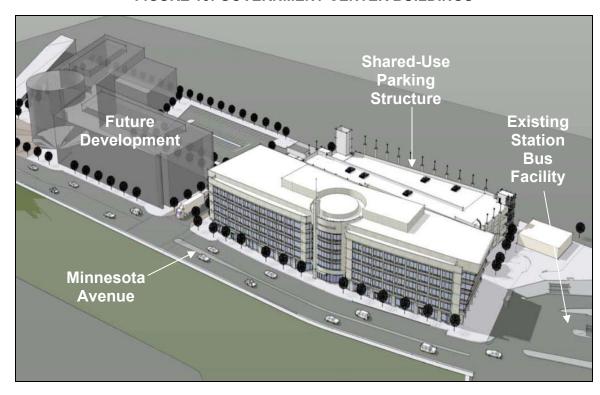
GOVERNMENT CENTER BUILDINGS
